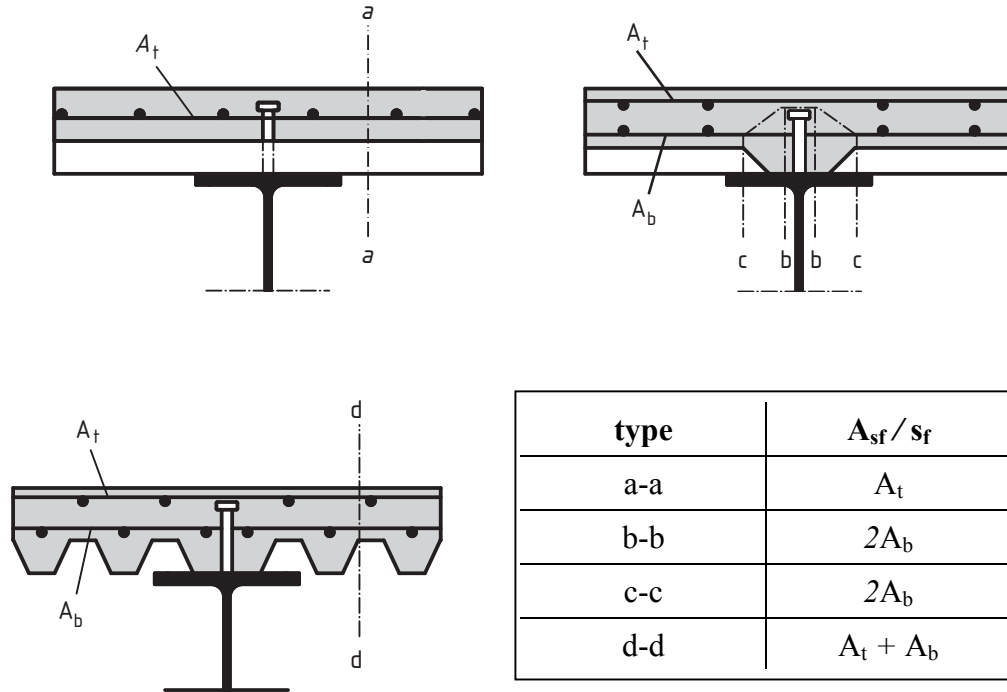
Typical potential surfaces of shear failure where profiled steel sheeting is used
